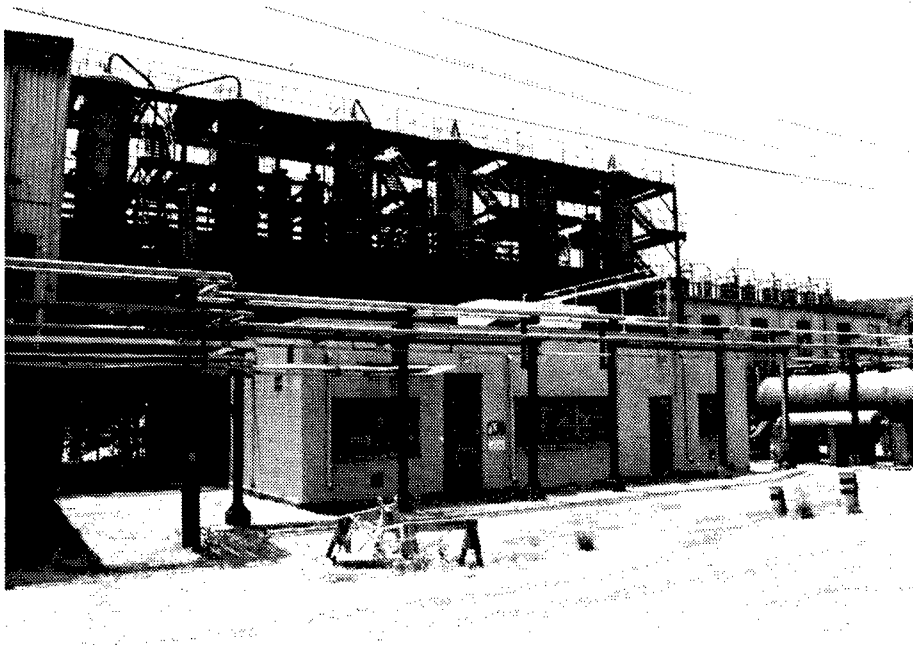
Building 330P: Ammonia Nitrate Pump House constructed of concrete block and fiberglass.
